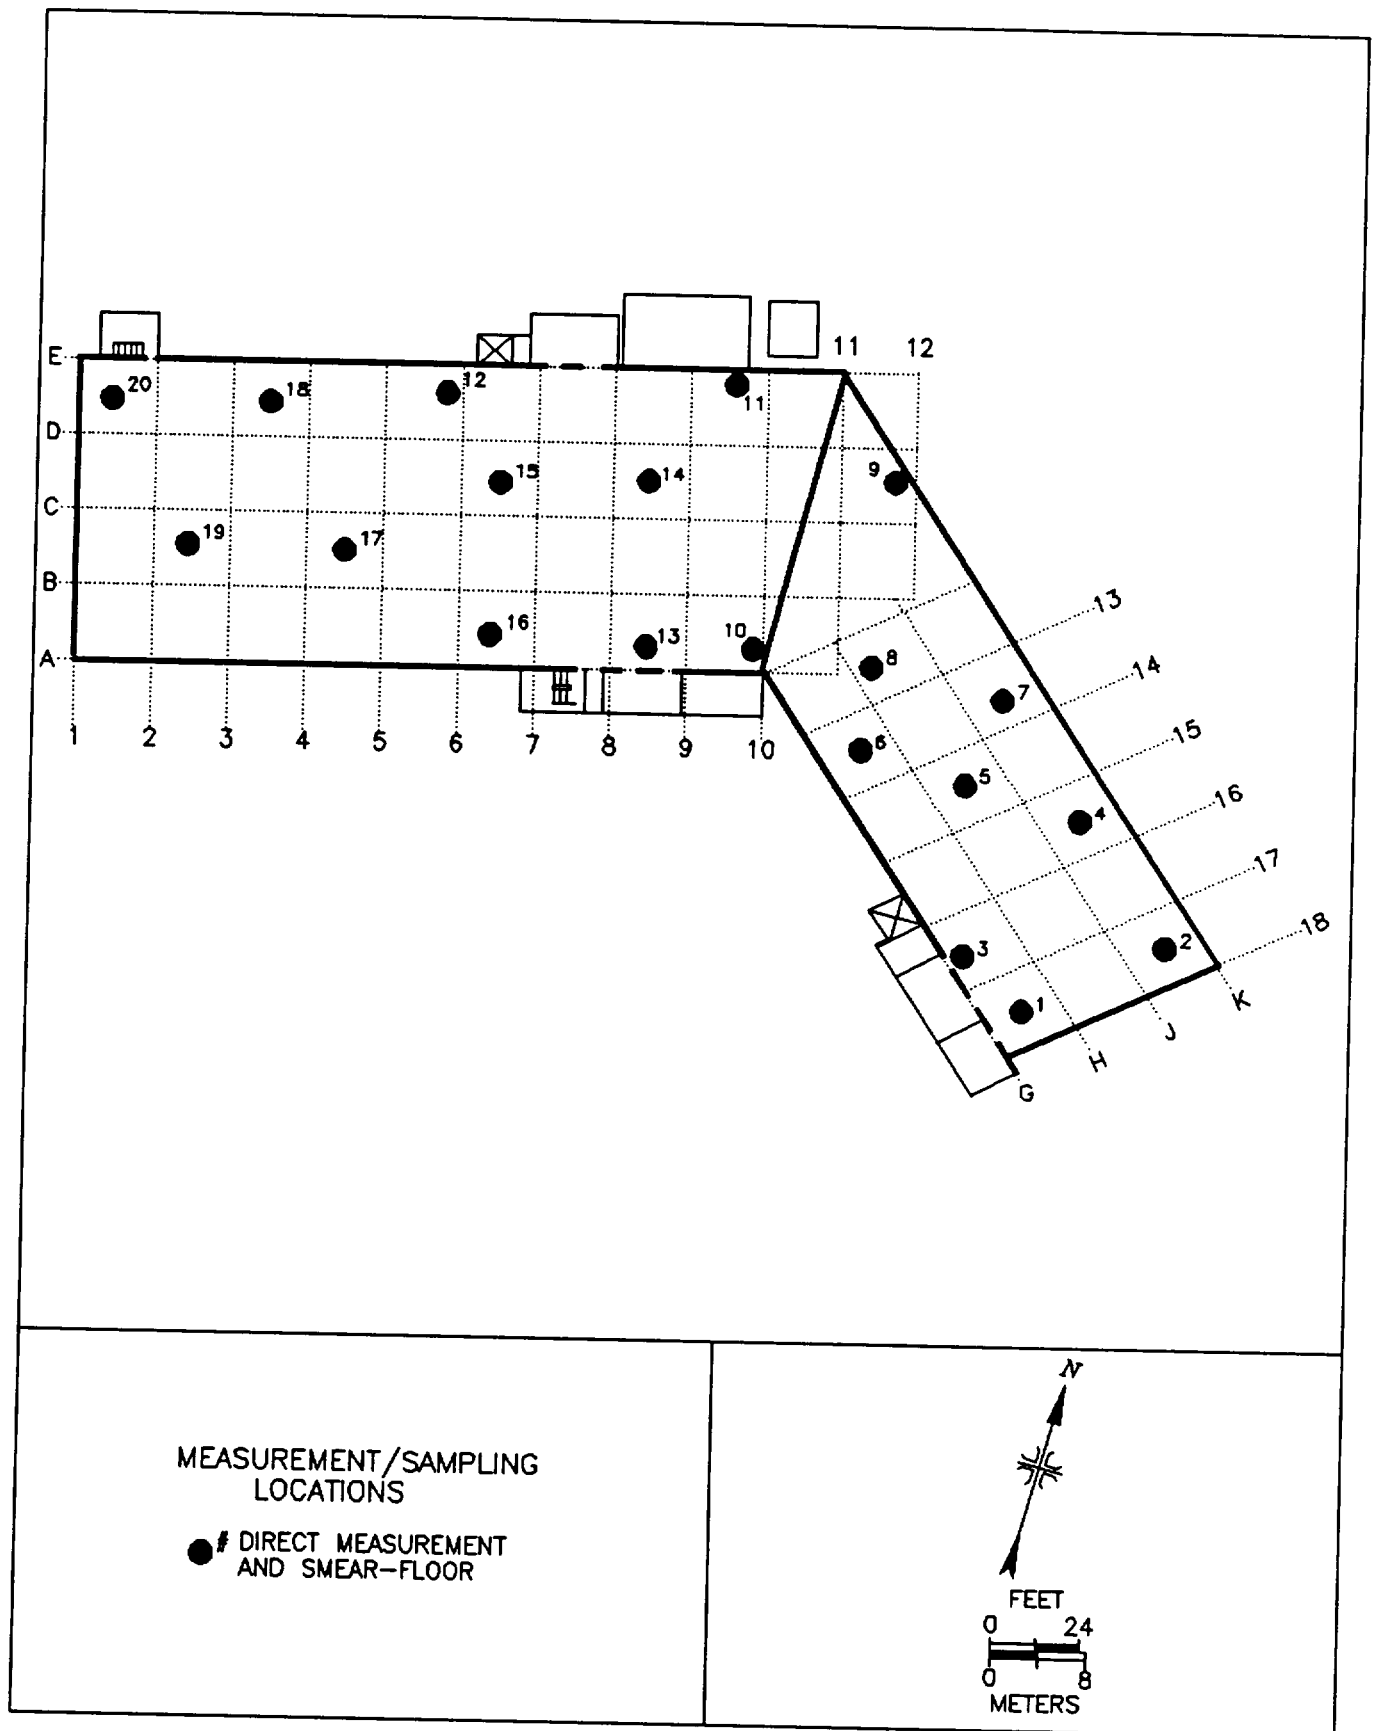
Building 8, Fifth Floor – Measurement and Sampling Locations
